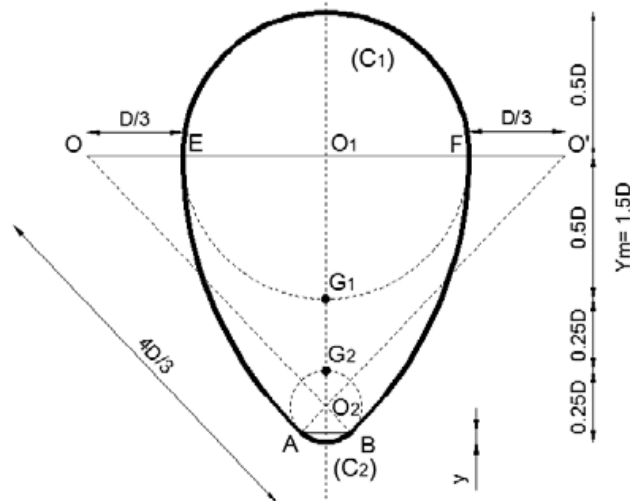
Egg-shaped conduit profile for heavy load (Photo: ACO)
